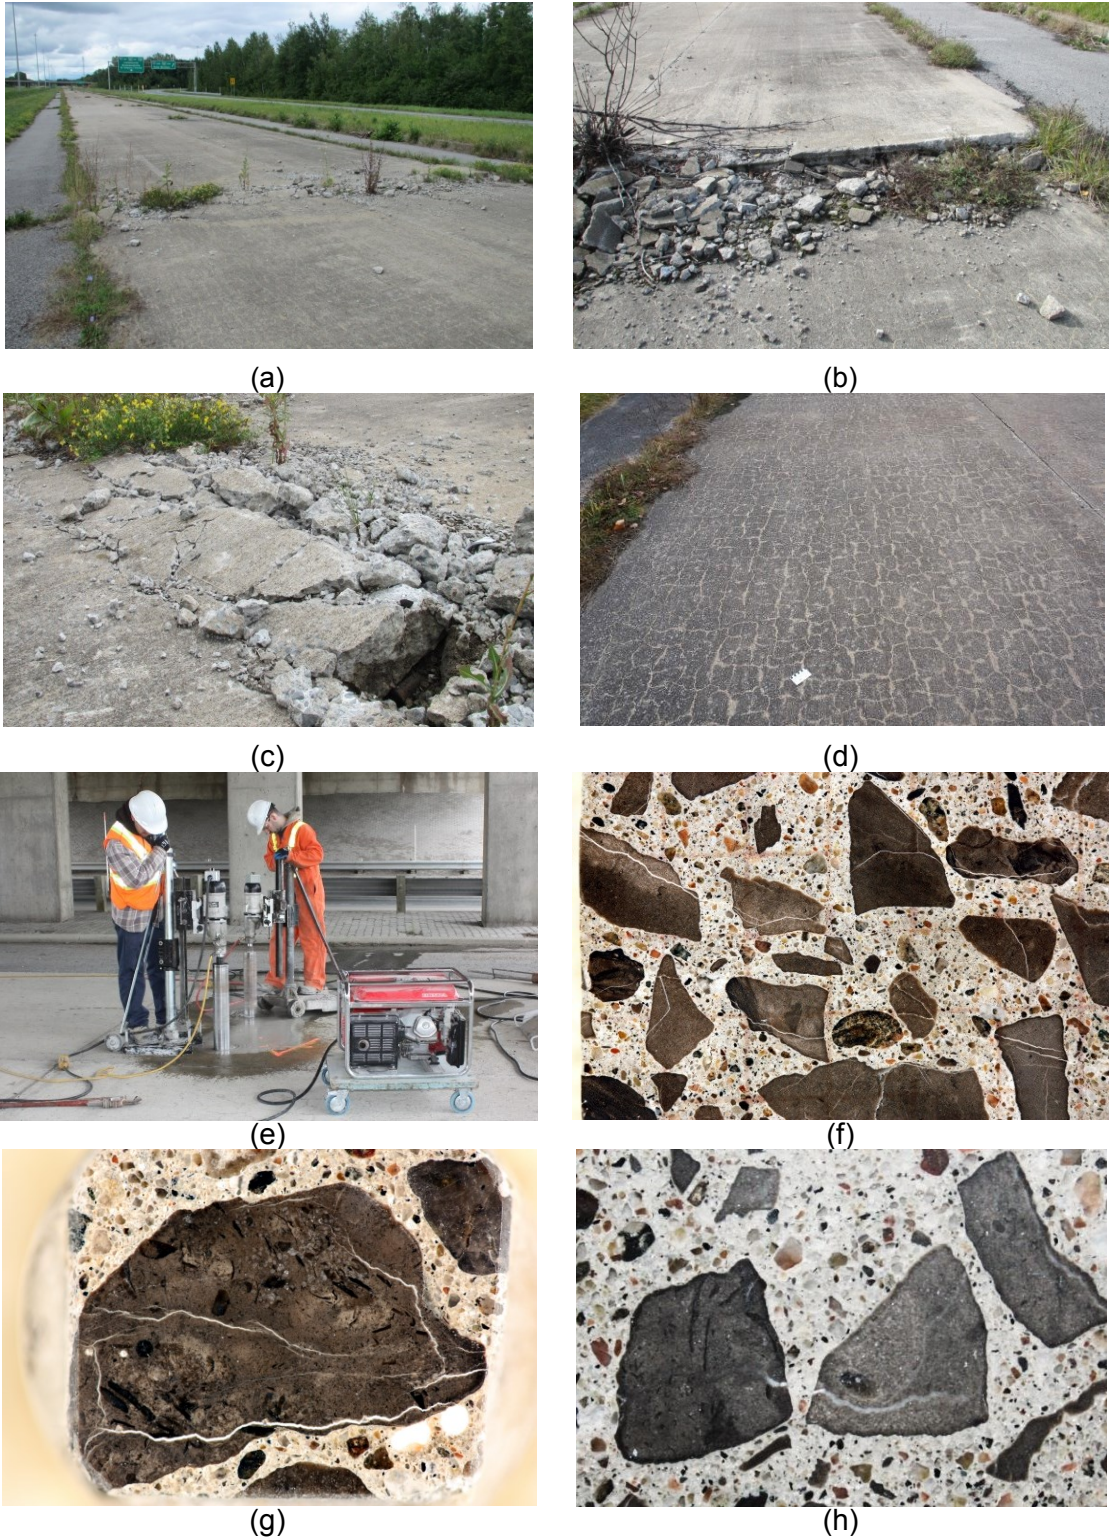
(a-d) General view and condition of the concrete pavement in Bécancour (Québec); blowing at joints and extensive cracking are observed in several sections of the pavement; (e) Coring of a concrete section of the pavement; (f) Plane polished slab prepared from a core extracted from an heavily-cracked section of the pavement; (g) Sample used for Phase 1 of the experimental program; (h) Sample used for Phase 3 of the experimental program.
